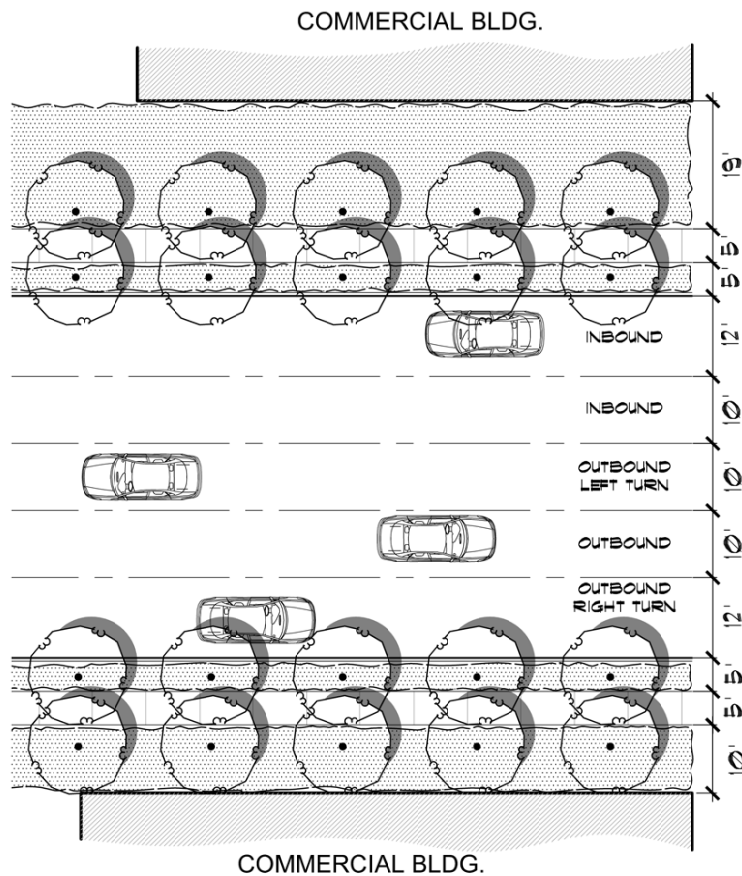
Via Villagio Private Streetscape Section and Plan
